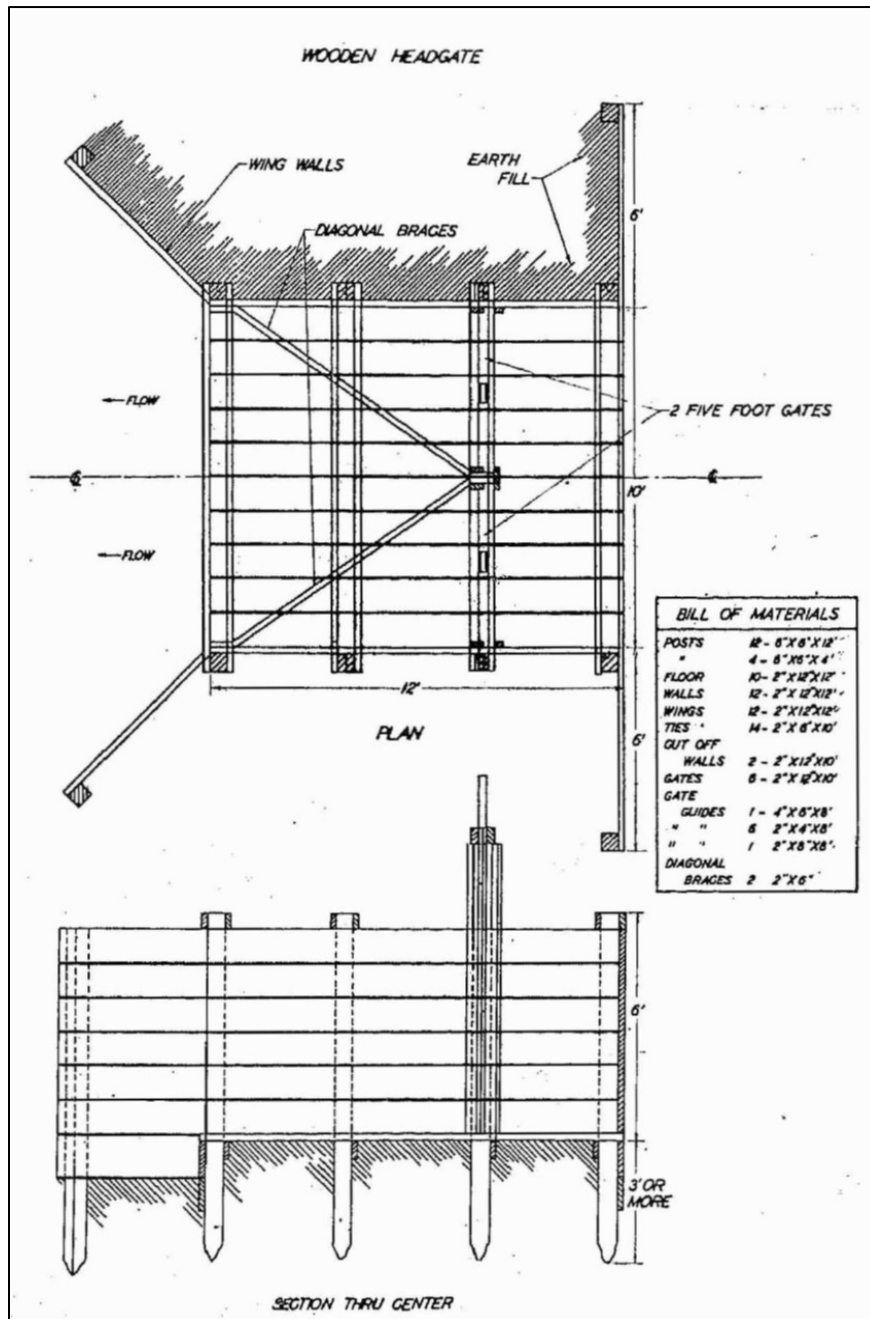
A drawing showing two views of a wooden headgate.²⁵¹
